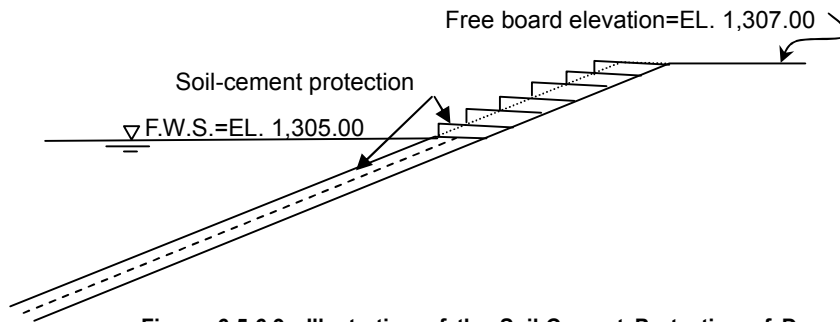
Illustration of the Soil-Cement Protection of Dam No.1
